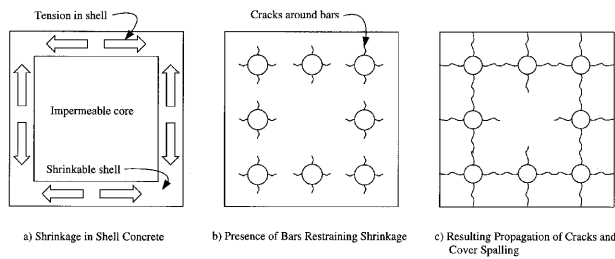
Factors promoting cover spalling in high-strength concrete columns (adapted from Ref. 29)
